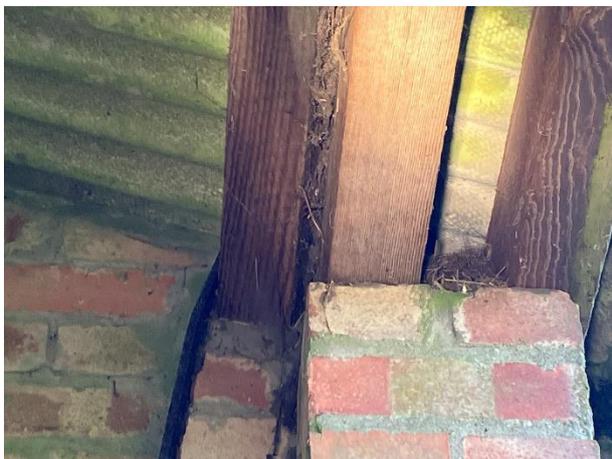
Bird nest on top of wall, and dirt / debris filling the gap between two adjacent wooden beams
